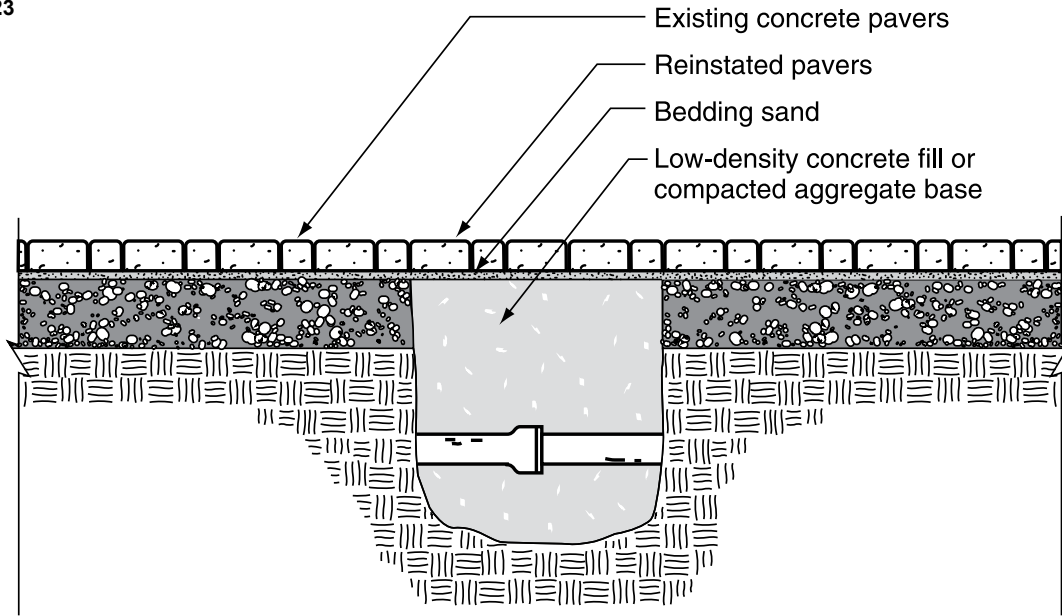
Cross section of reinstated utility cut into interlocking concrete pavement.
